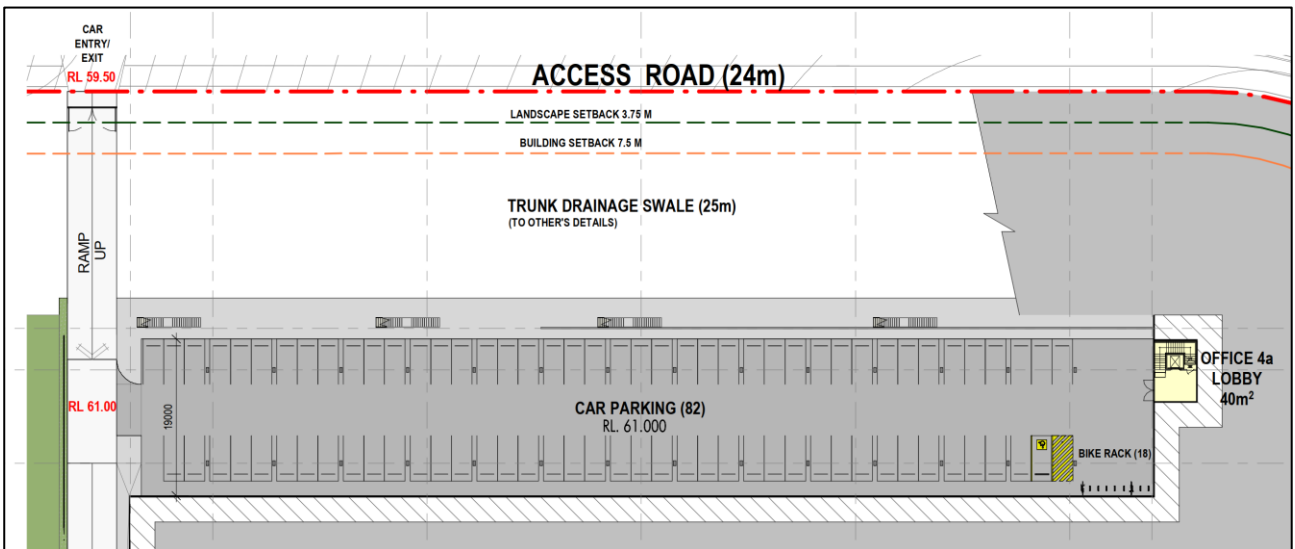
Approved Lower Ground Floor Plan – LOT4, Drawing number: 12587\_DA104, Issue P2, dated 13/02/2023
